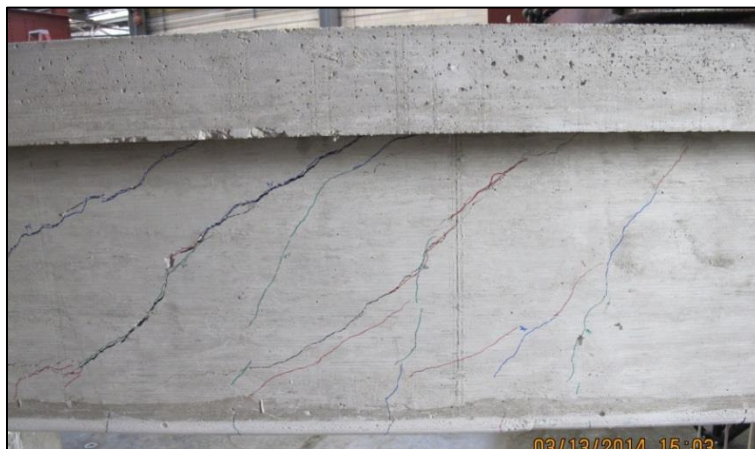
Cracking pattern of west face 8-3-Control
